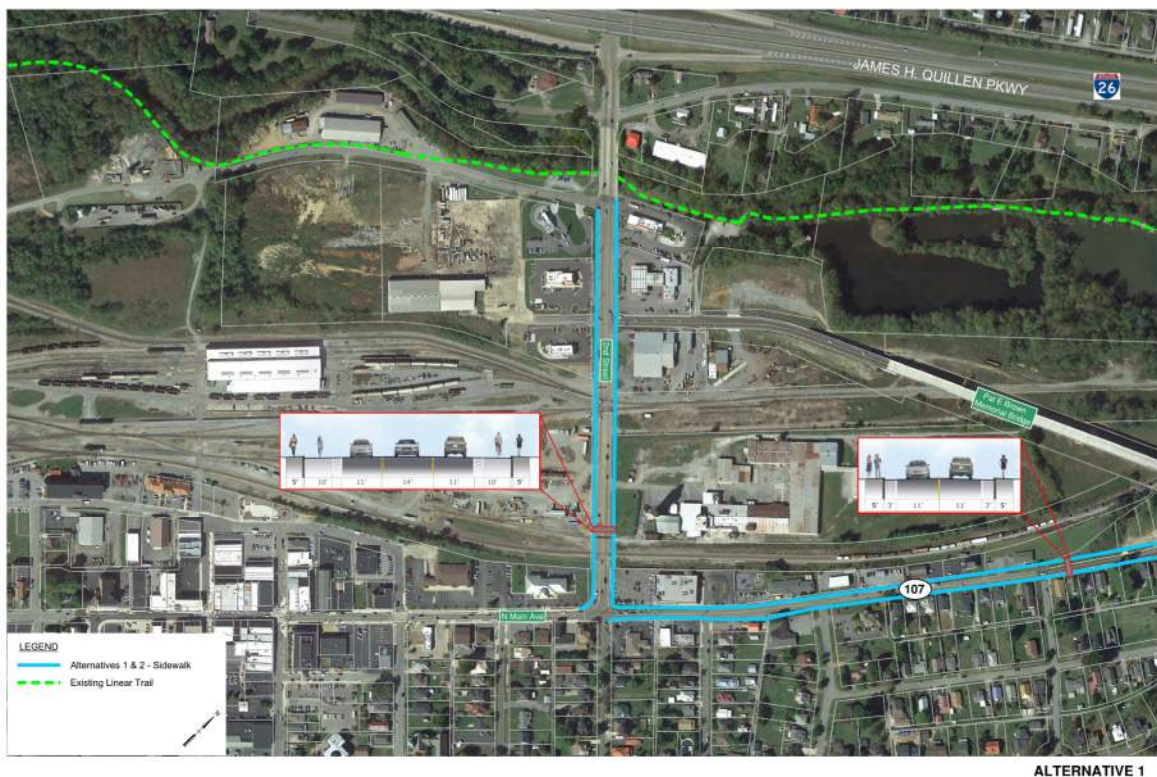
Erwin and Unicoi Recommended Alternatives 1 – Plan Sheets Page 2
